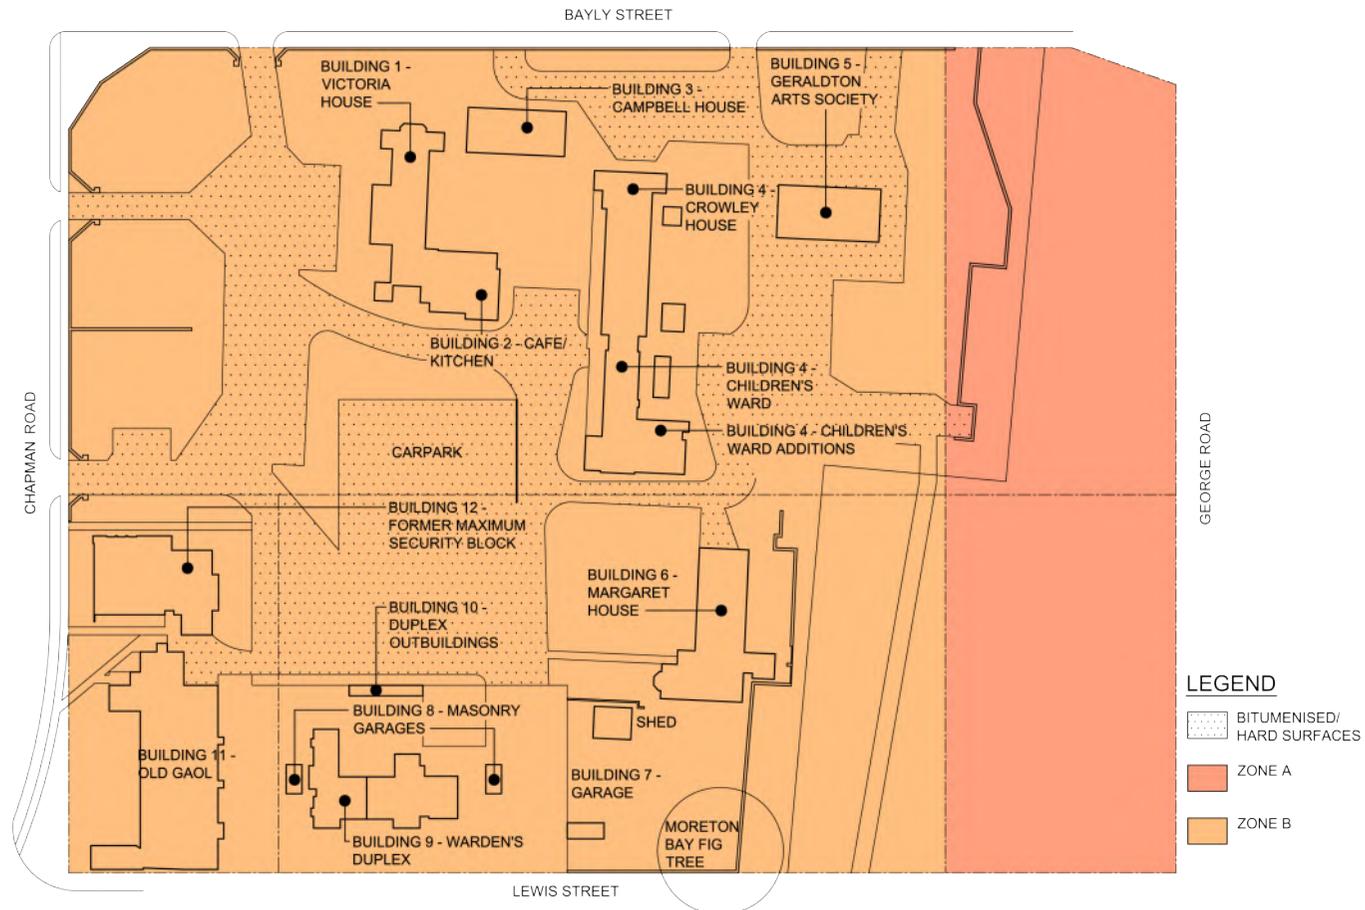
SITE PLAN WITH EXISTING FEATURES AND SITE ZONES
